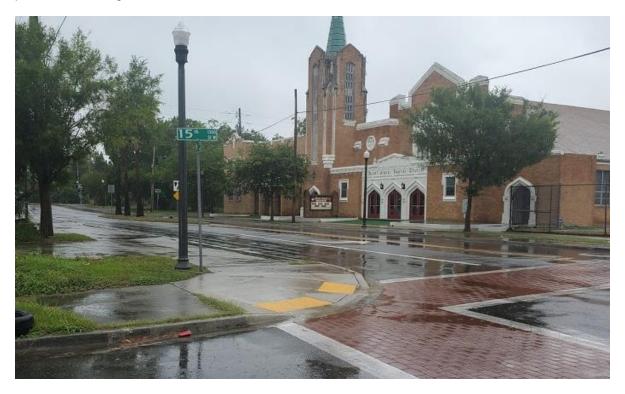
Facing North: South connection at existing 16-inch water main stubout at northwest corner of Myrtle Avenue North and West 15th Street.
